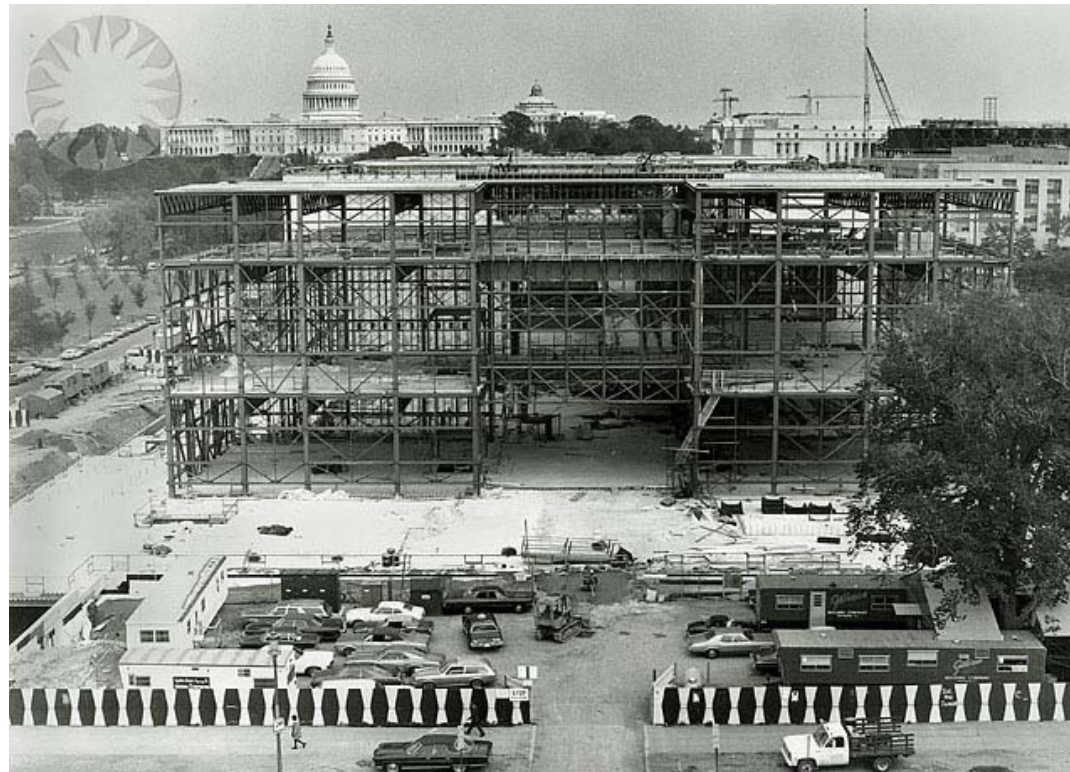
1: NASM under construction. View looking East towards the Capitol building. (Source: Smithsonian Institution Archives.)
